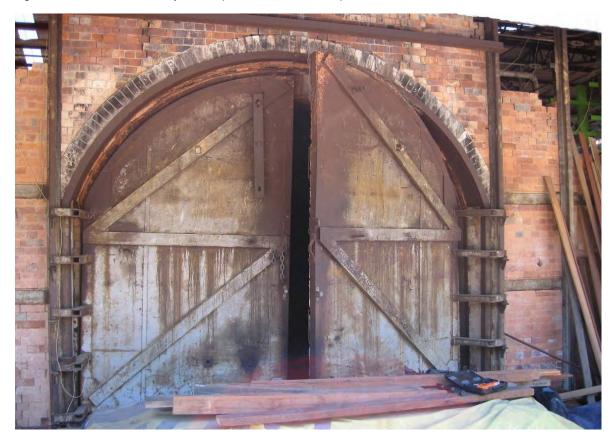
Kiln entry showing stepped side wall. (Source: Lovell Chen, 2010)
